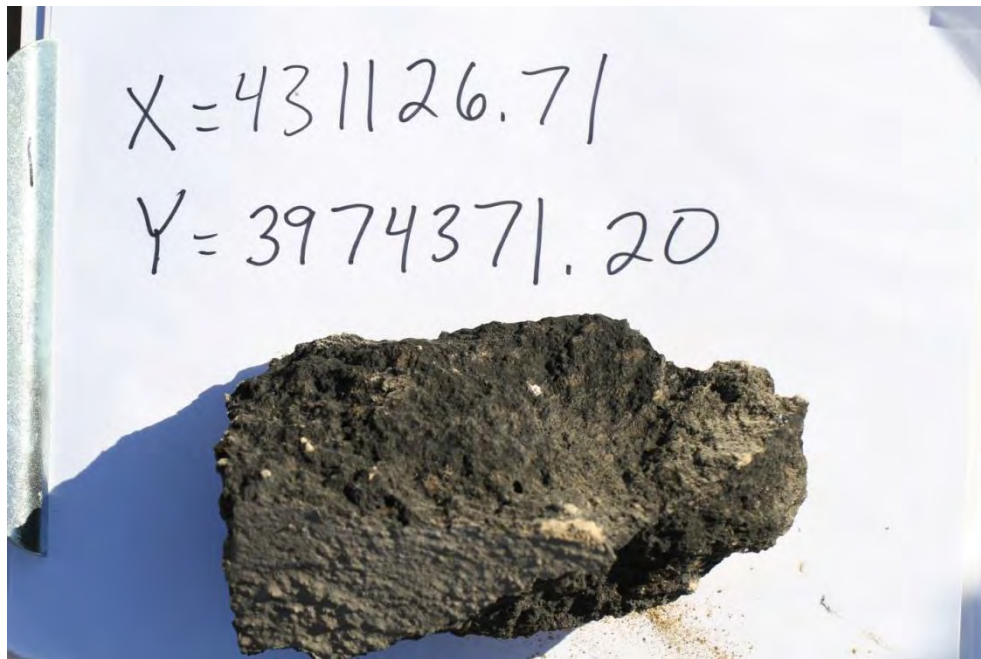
Roof Fragment Weighing 1,029.7 g That Was Found 84.9 m Northeast From the Center of the Structure (Test 4).
